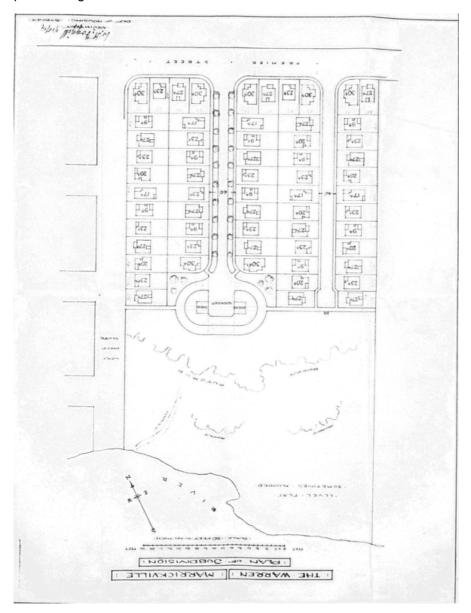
Plan of subdivision of the Housing Board estate (McGowan Avenue) of 1919. Note: plan oriented so that the top of the image is approximately north. Source: State Library of New South Wales (Sydney Subdivision Plan M9-247)
